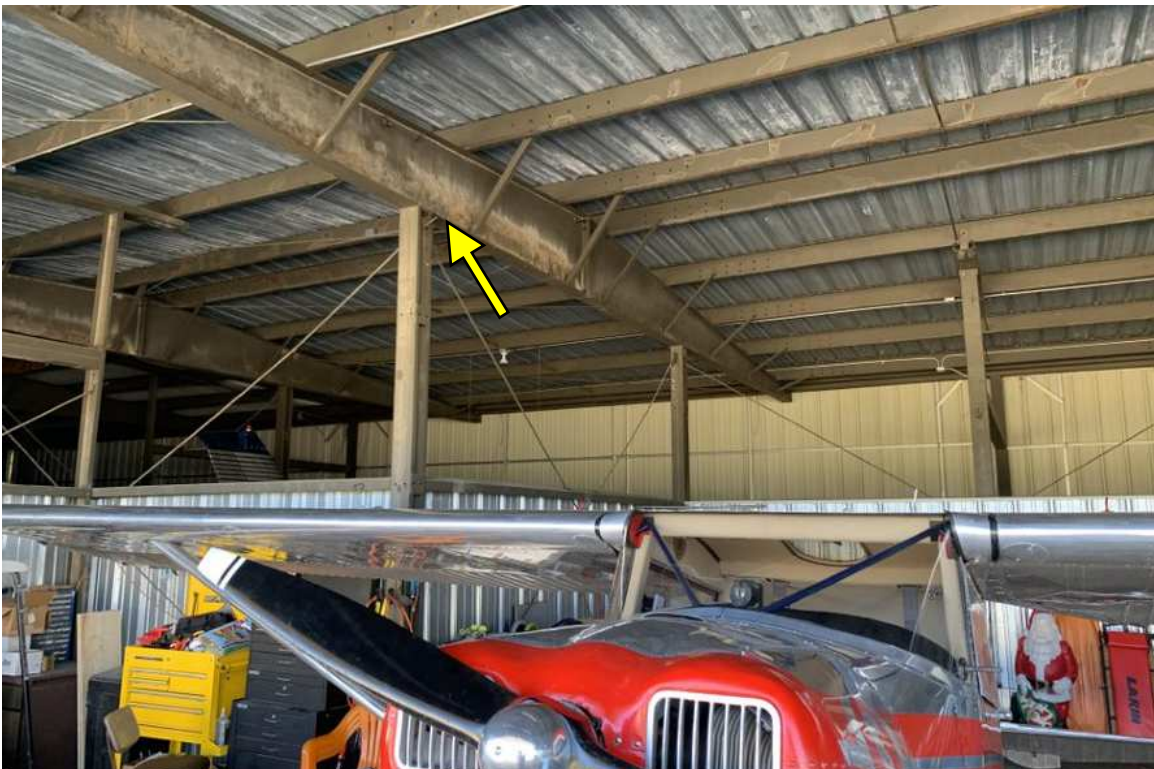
IMG\_6688 – Building 1, Unit 8 – Example wide-flange girder candidate for cleaning and inspection to evaluate extent of rust/deterioration damage.
